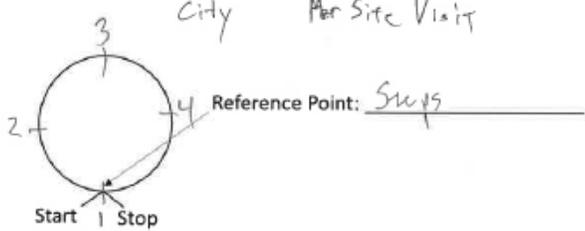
Reservoir INTERIOR WALL Elevation– Note location of ladders and other features.
